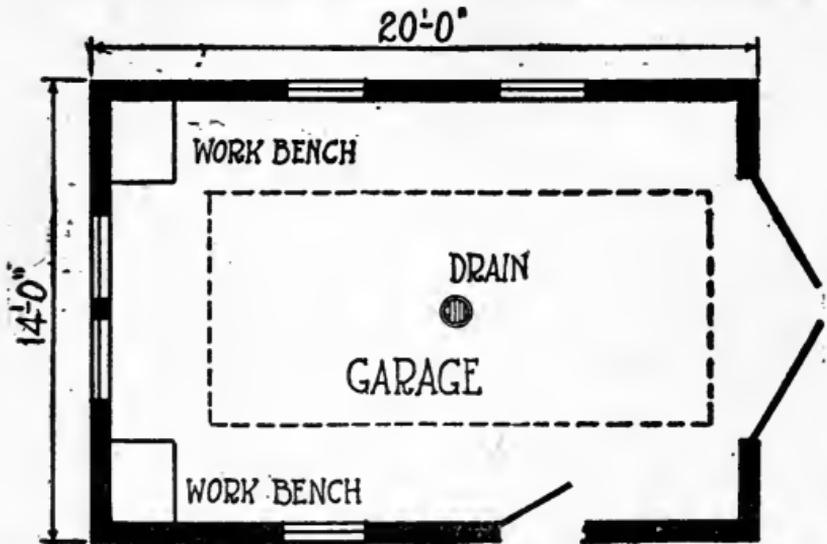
Floor Plan of Farm Garage 14 Feet in Width by 20 Feet in Length
